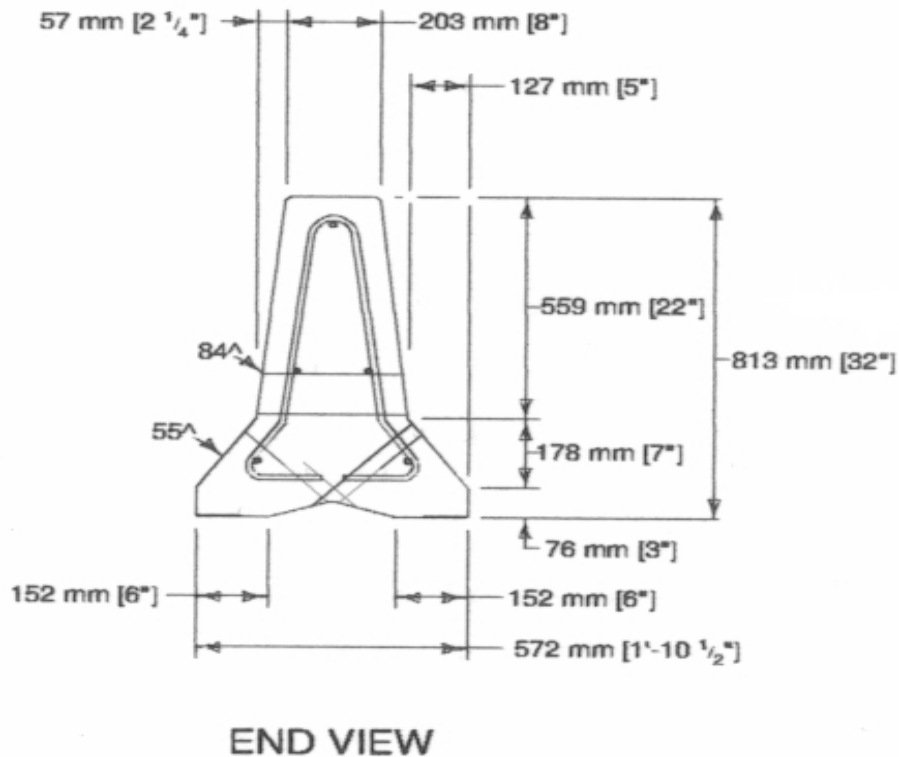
Iowa F-Shape Temporary Barrier Rail (1)
